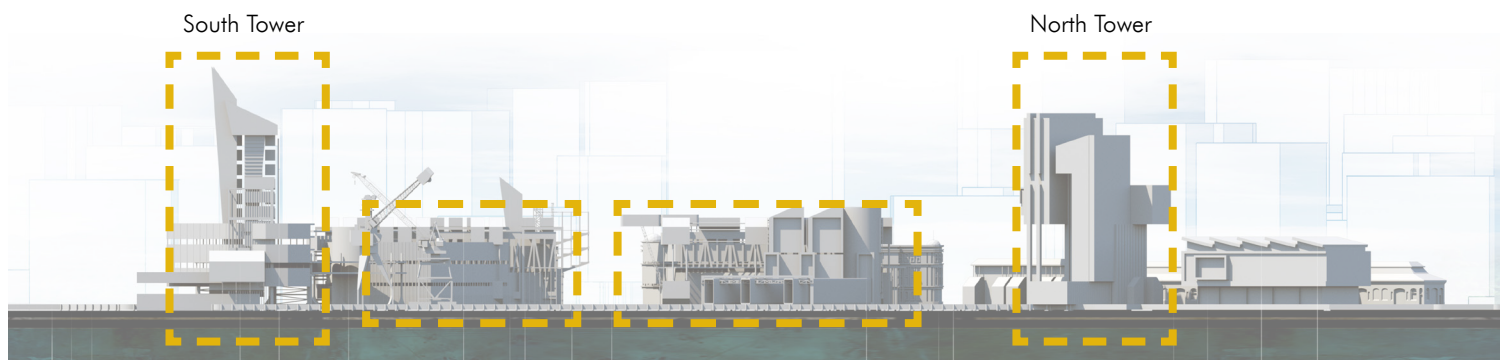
Street elevation looking towards the city from the harbour direction.
